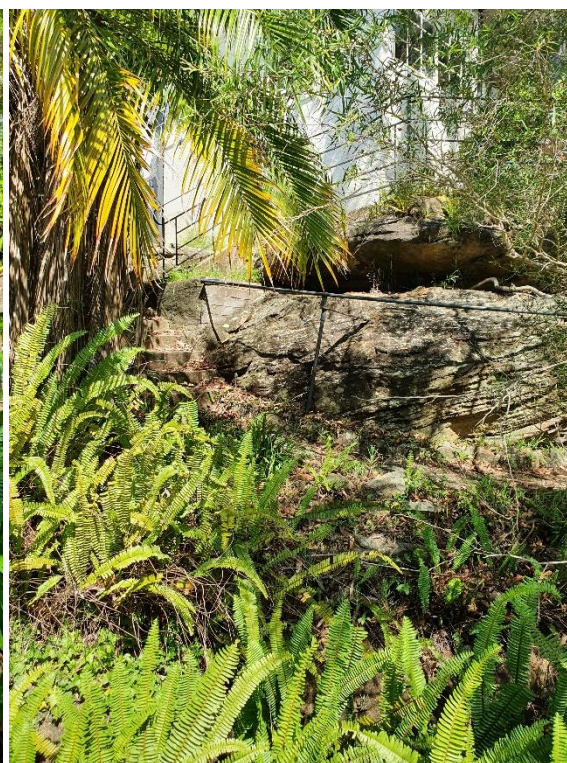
Existing underpinning of bedrock at the front of the site, facing north
